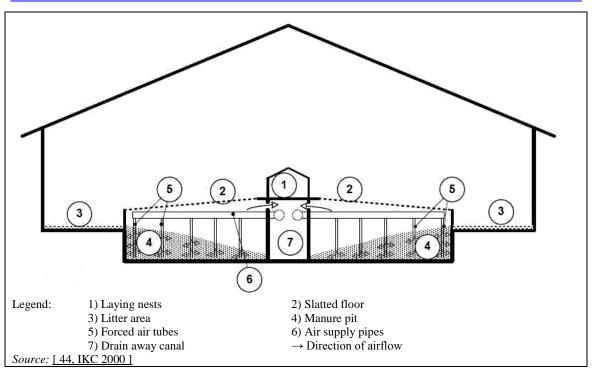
Cross section of system with forced air drying by vertical tubes
